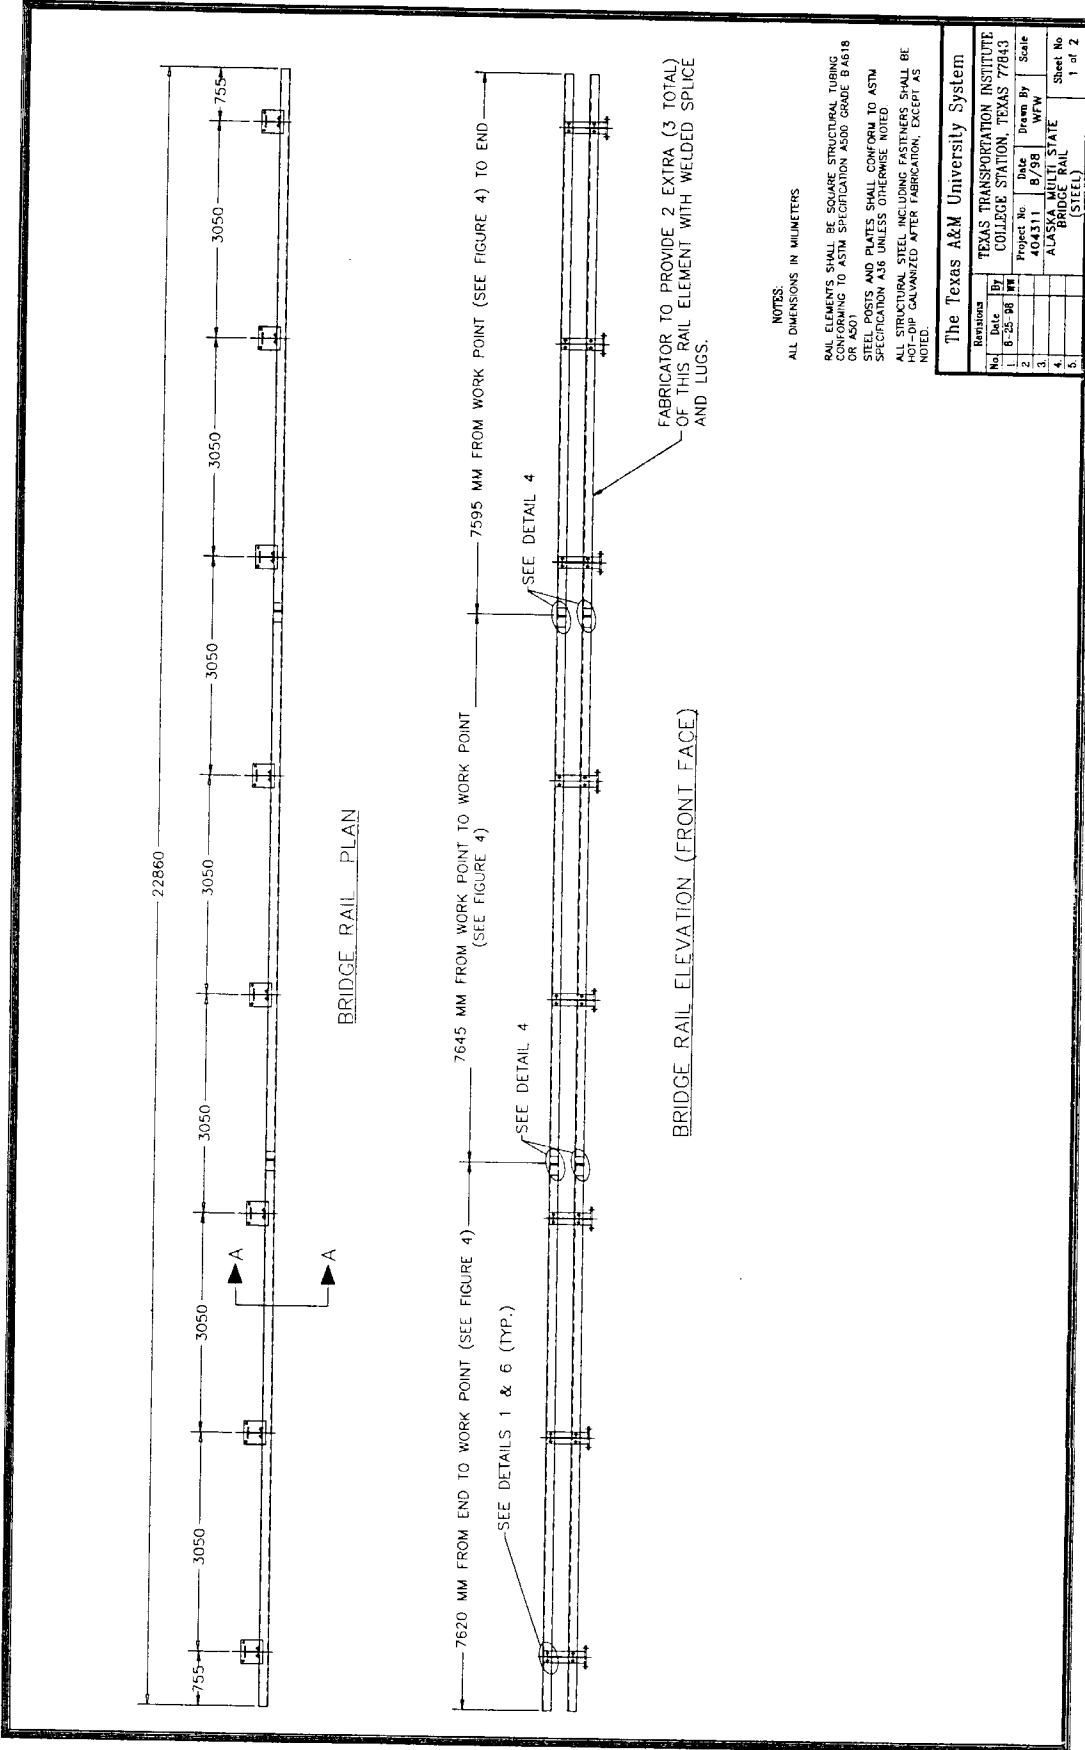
Details of the Alaska Multi-State Bridge Railing mounted on the curb (concrete).
